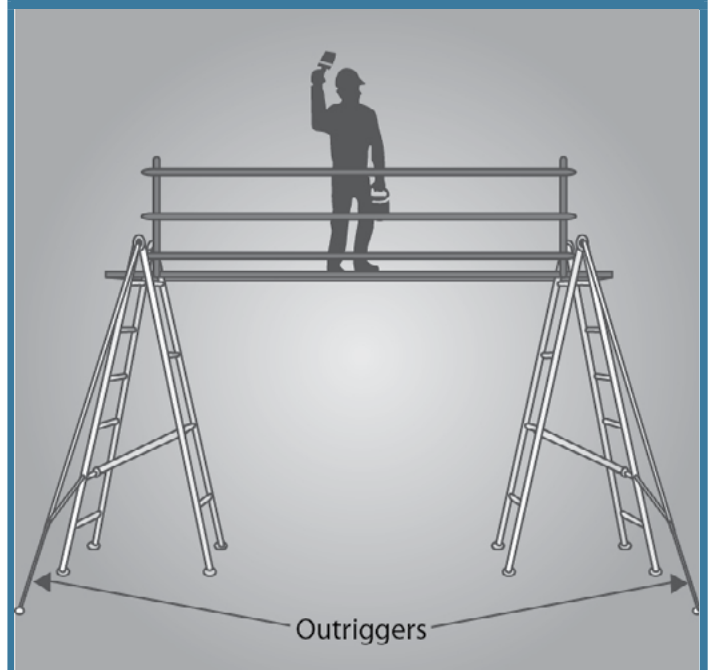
Trestle ladder scaffold with guard rails and outriggers for stability.
